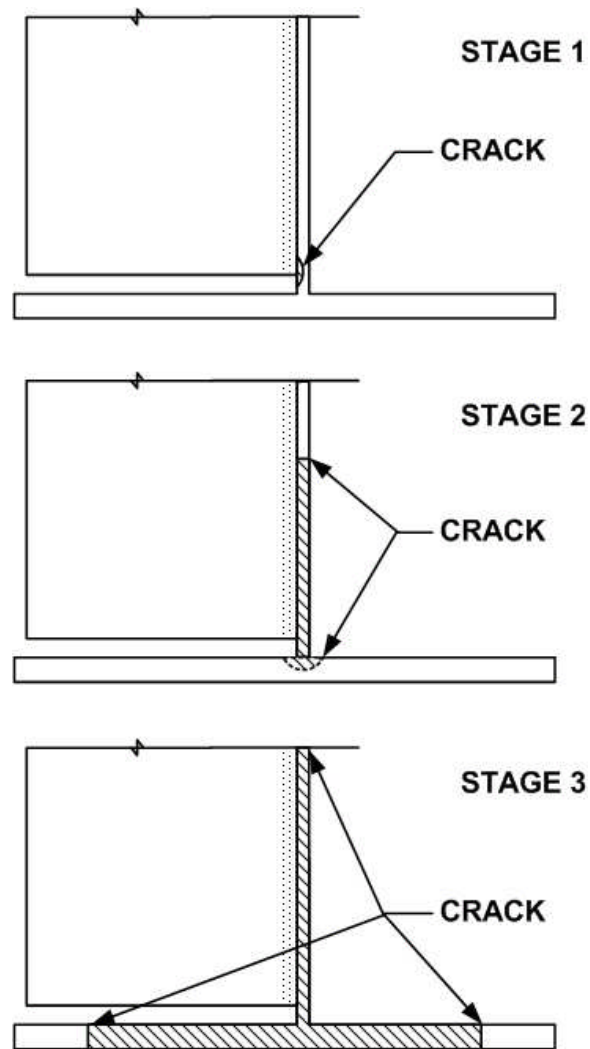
Crack Growth at Transverse Stiffener Welded to Web
